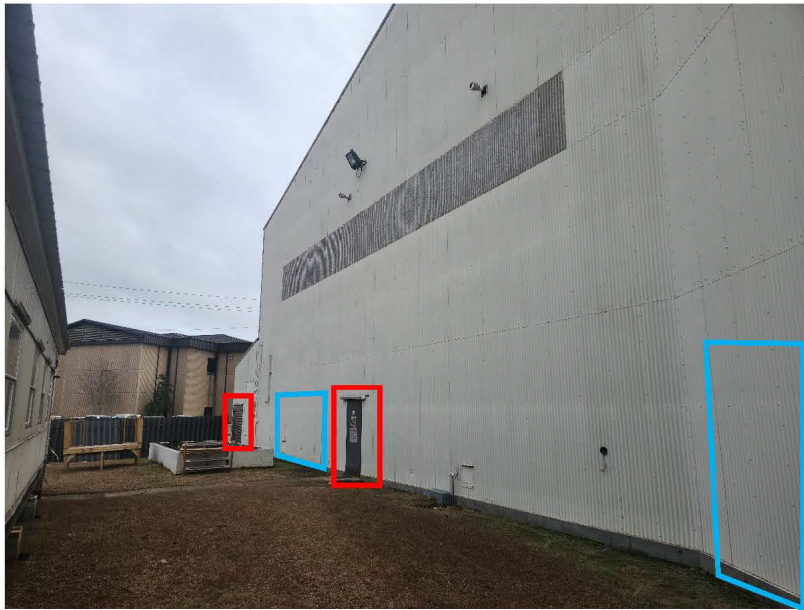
Image showing the current composition of the northeast elevation. The doors indicated in red would be replaced in-kind. The new steel doors would be added in the approximate locations indicated in blue.
